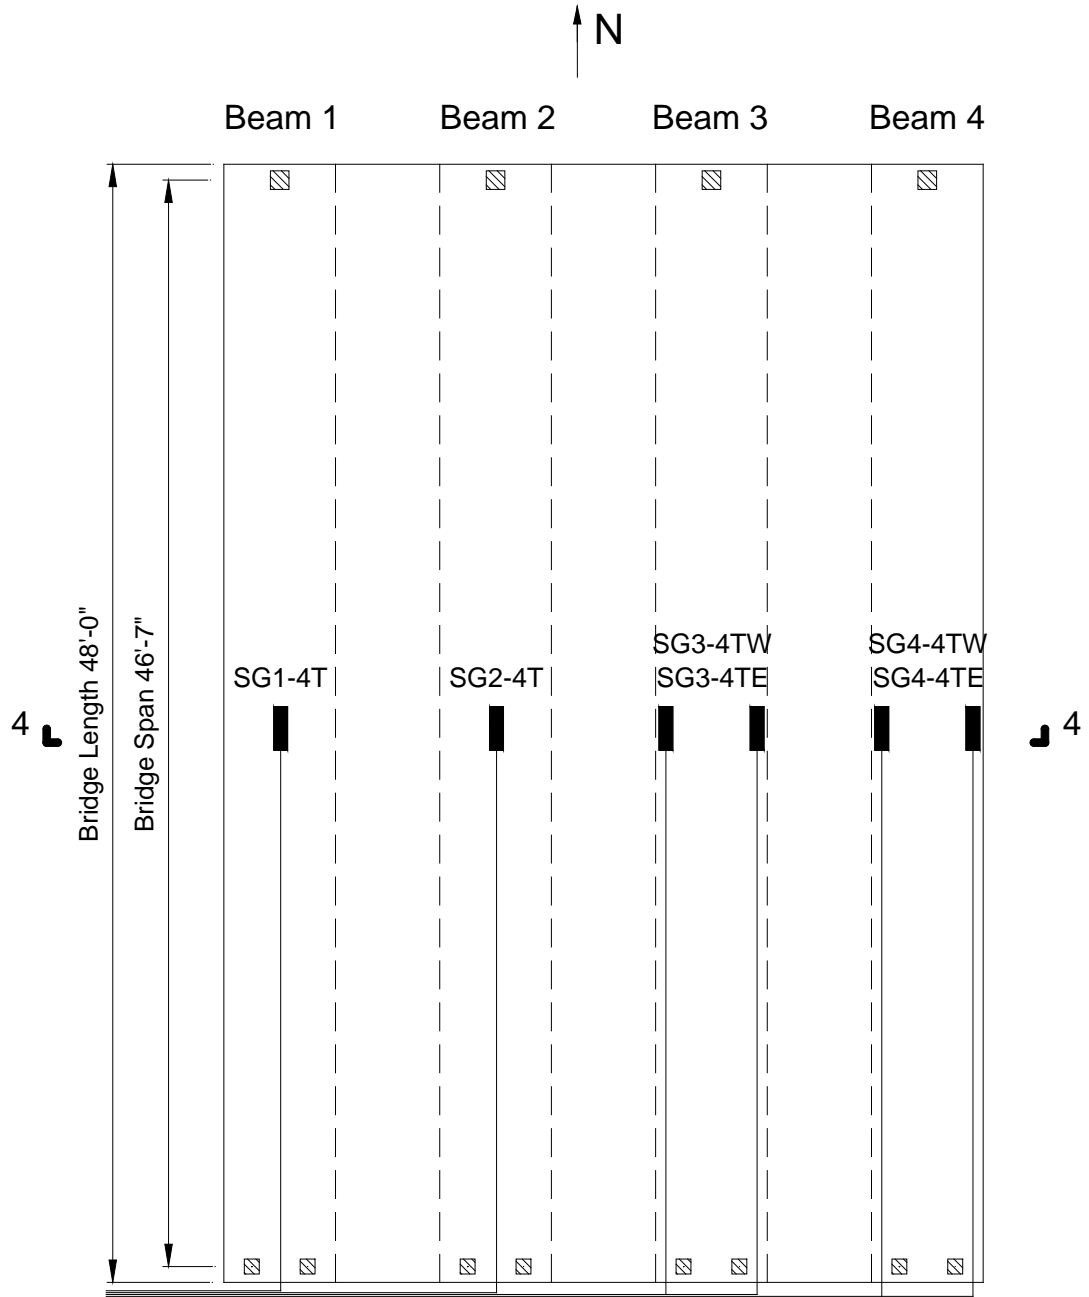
Plan View of Instrumentation on Top Deck Surface of Riverside Bridge.
